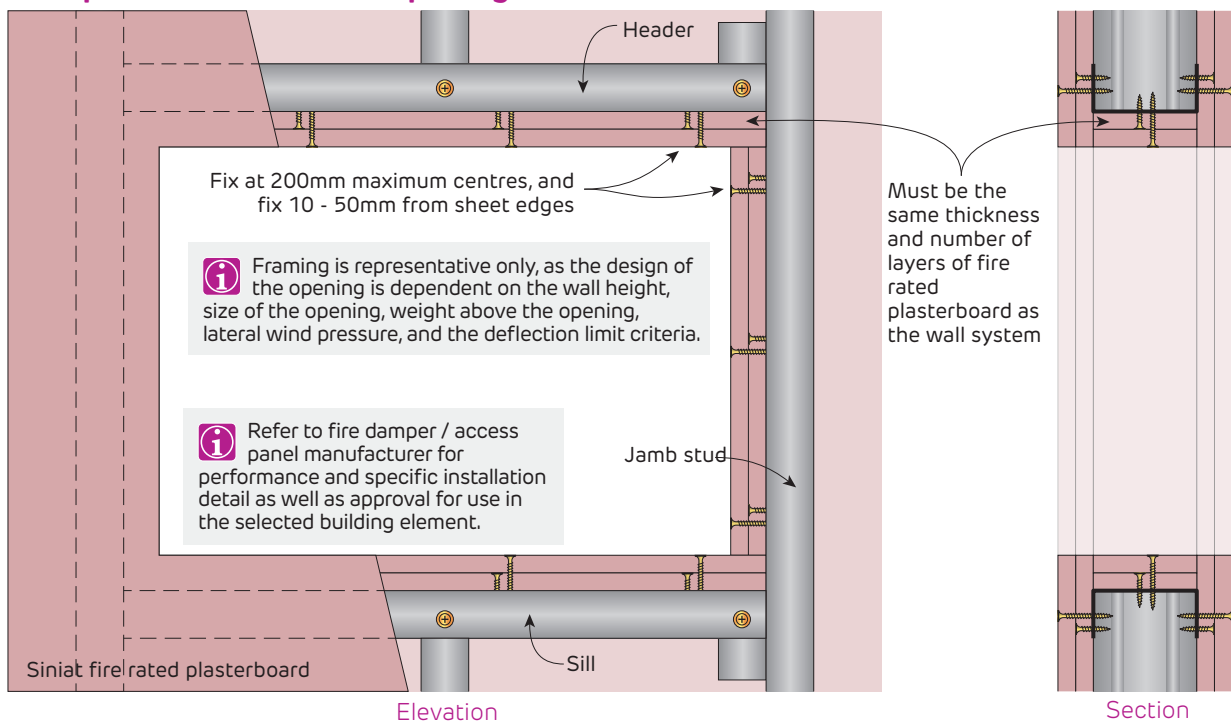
Typical Opening Detail for Fire Damper or Access Panel
